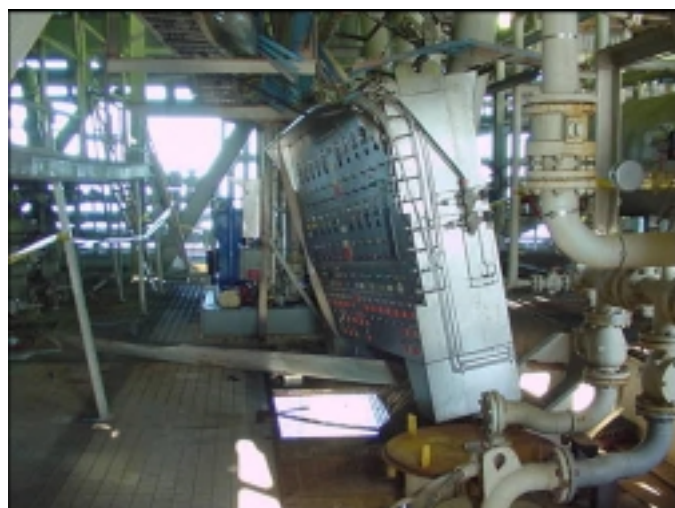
Damaged Equipment from Wave-in-Deck Forces
